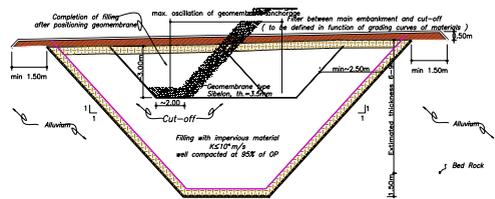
Gibe III Cofferdam. Anchorage of the impervious geomembrane core in the clay cut-off trench.
